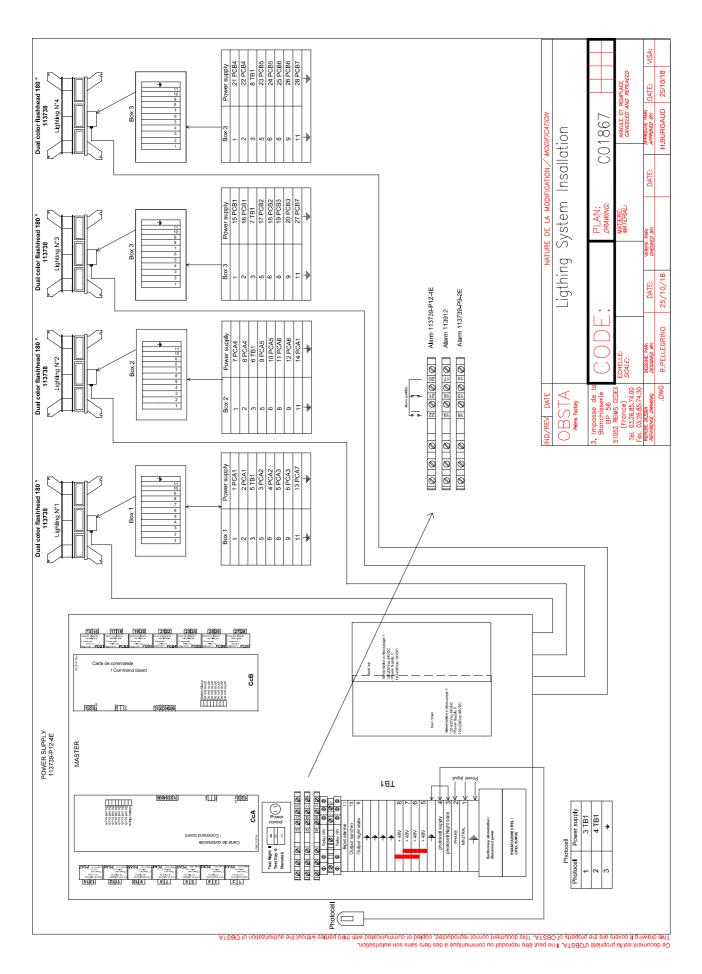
TYPICAL WIRING DIAGRAM WITH SYSTEM
